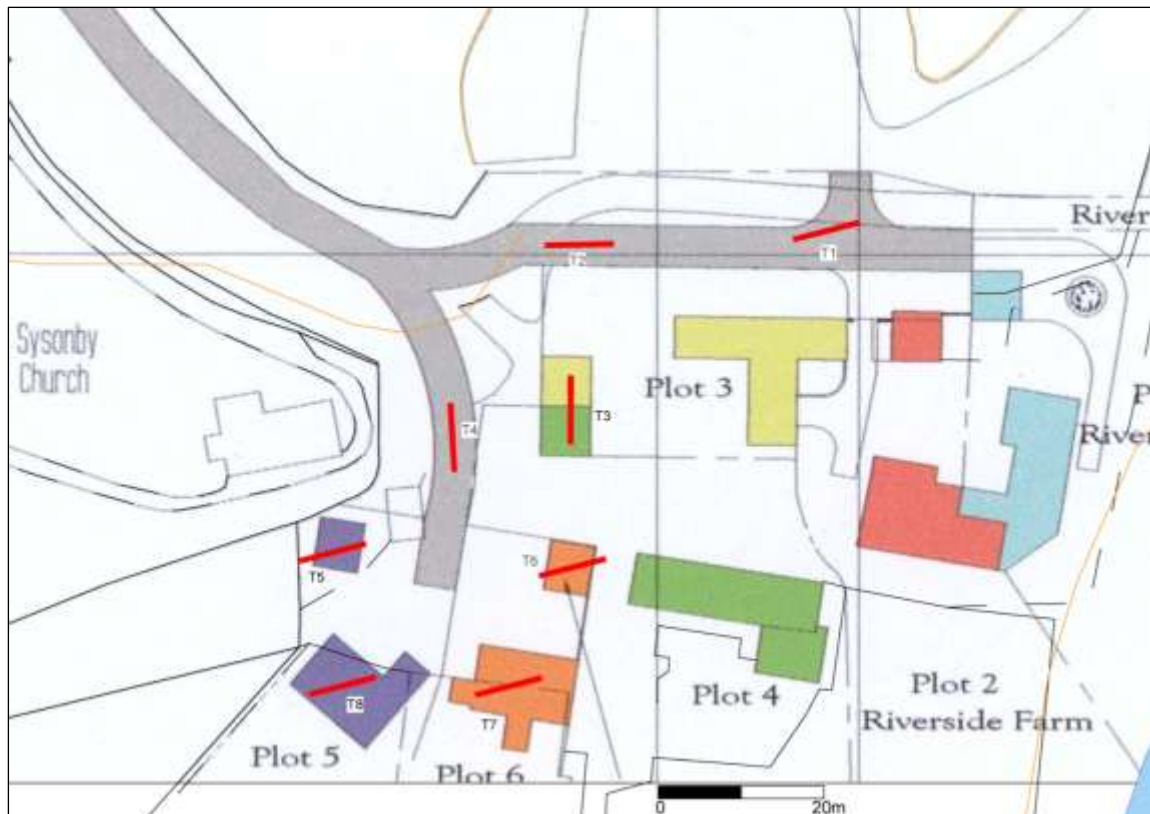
Client plan showing site location, proposed development and WSI trench layout.
